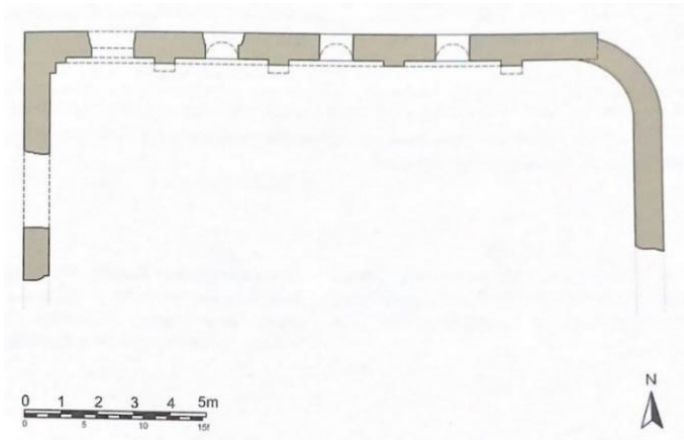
Plan of Küşne Church (EACHAR, 2018)
